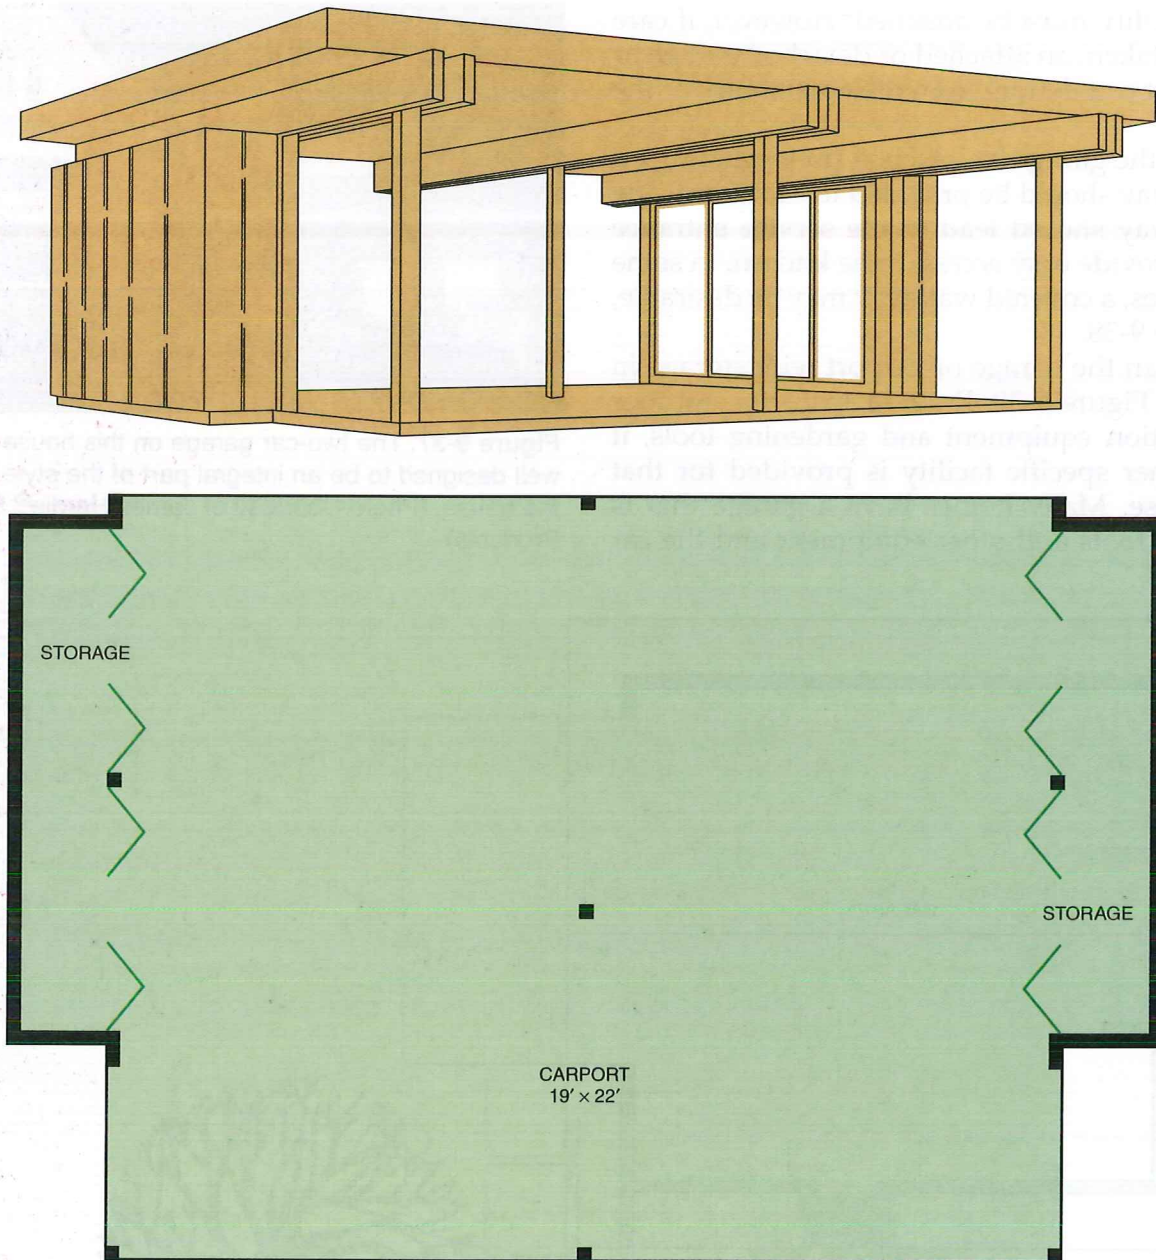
A perspective and plan view of a carport designed with storage in mind.
